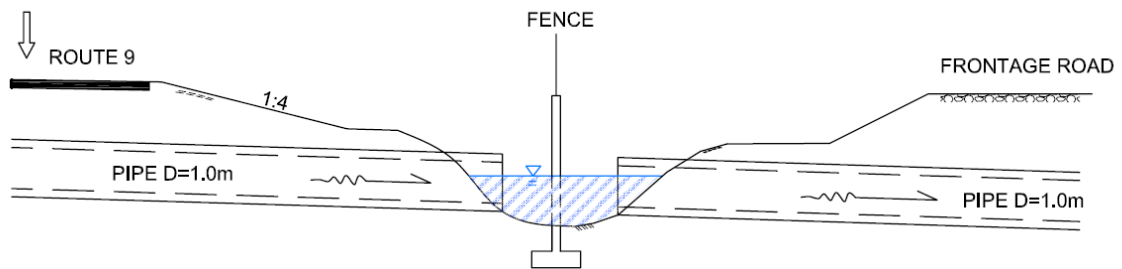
Catch Basin and Outlet Structure Inside of Fence
